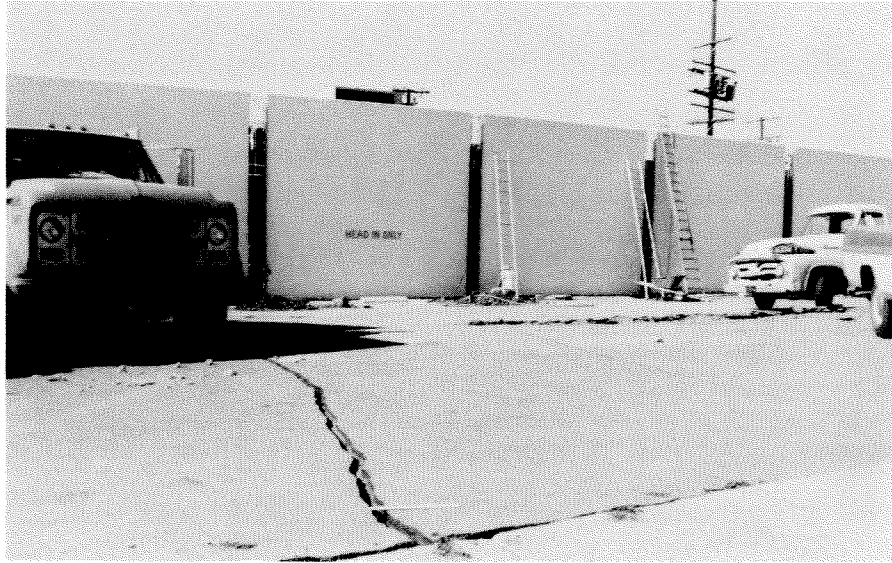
Repair work on tilt-up slab wall, two weeks after the earthquake. Adrian's Building.
